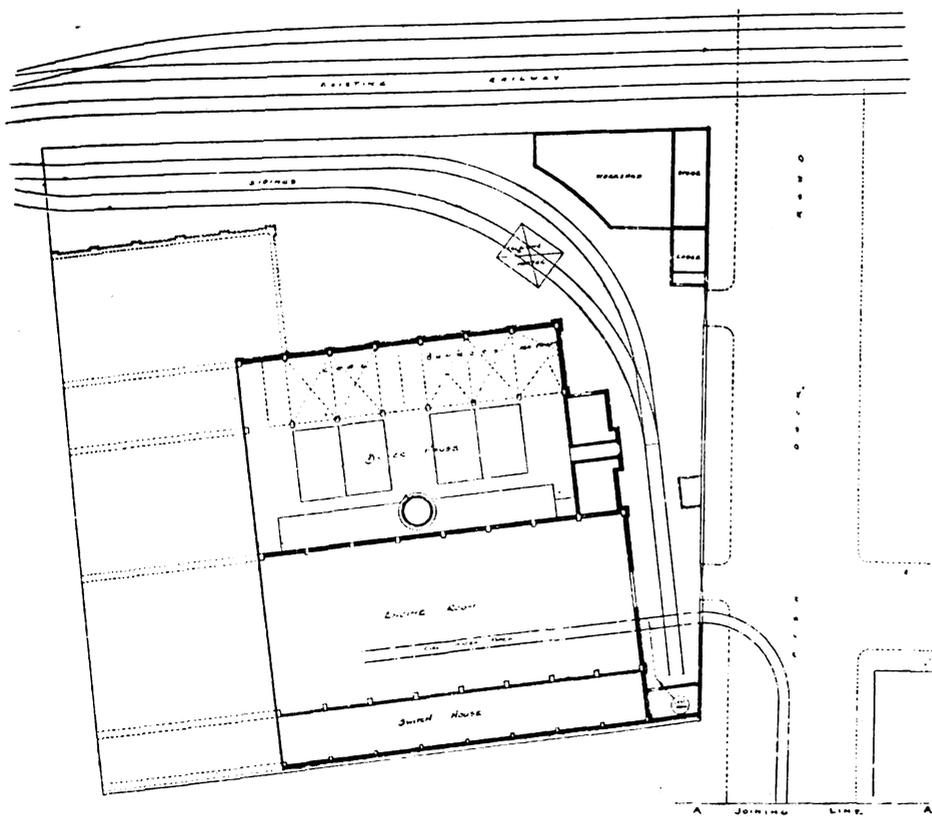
ARRANGEMENT OF STATION ON SITE.
